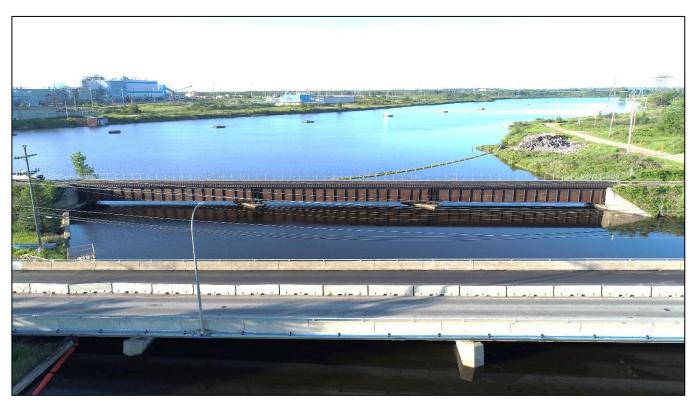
GENERAL VIEW FROM DOWNSTREAM
